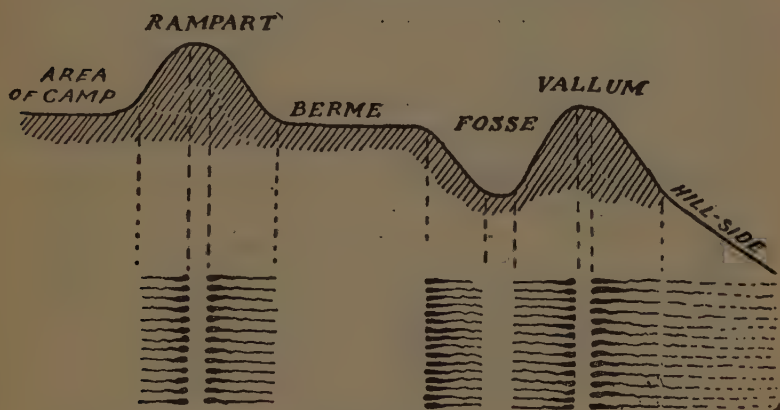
Section of Earthworks and mode of showing the same in plan.
